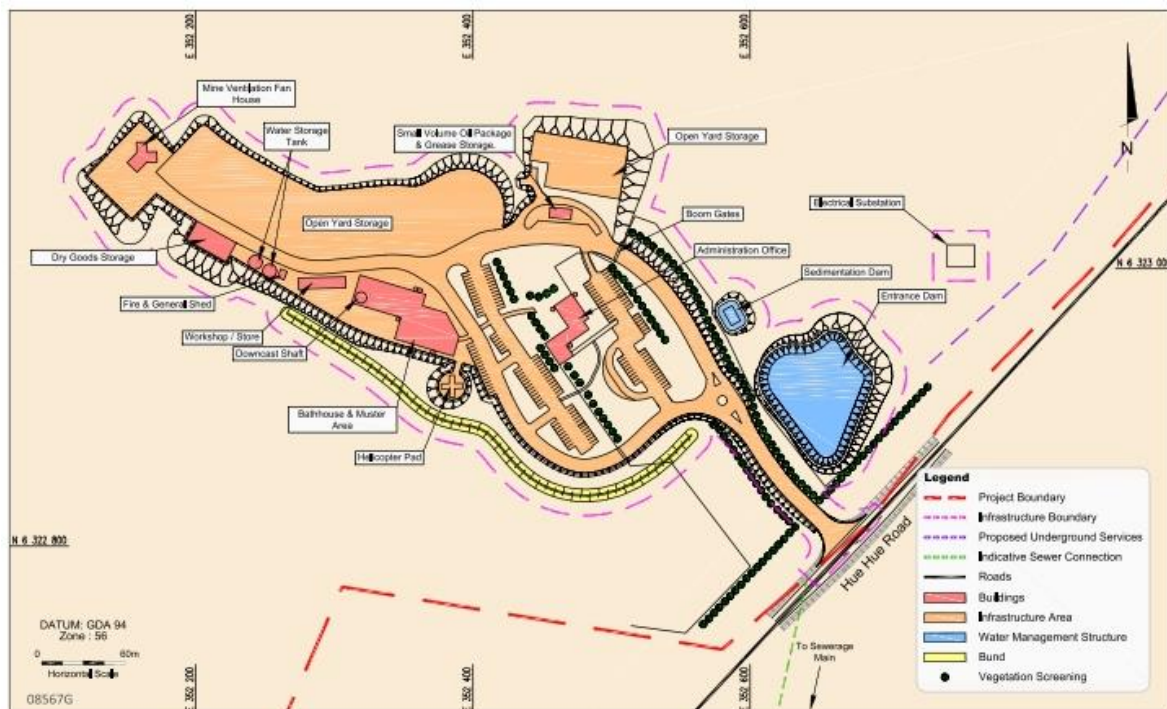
Buttonderry Site (Hansen Bailey, 2013a)
